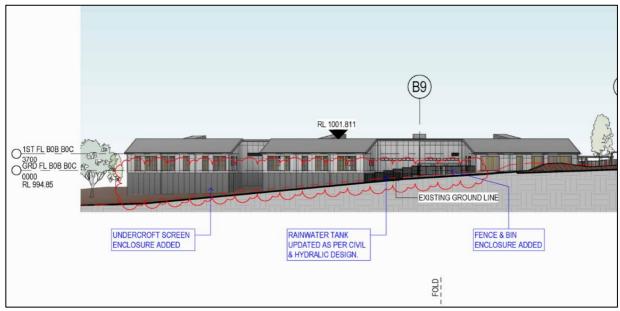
BLOCK B AMENDMENTS (WESTERN FAÇADE)
